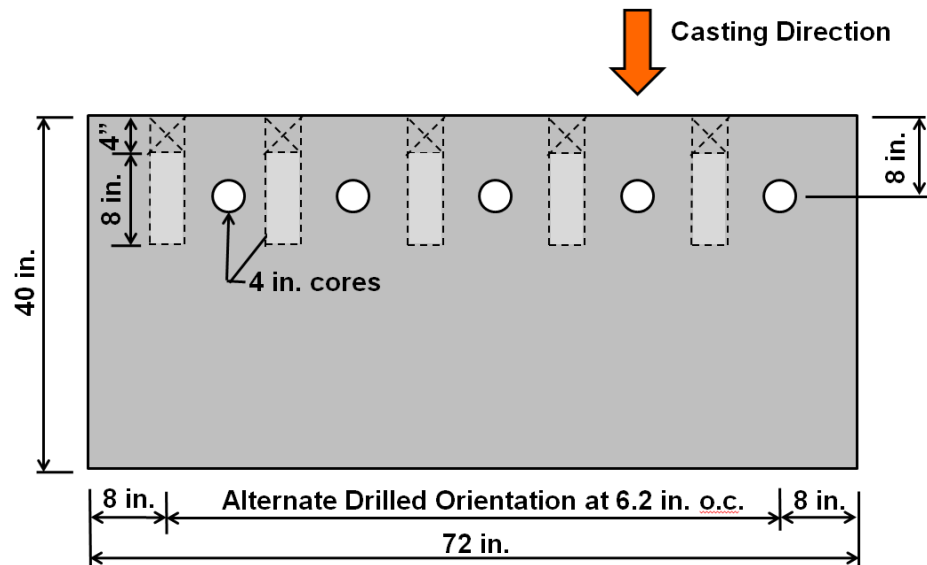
Elevation view for wall with approximate parallel and perpendicular core locations
